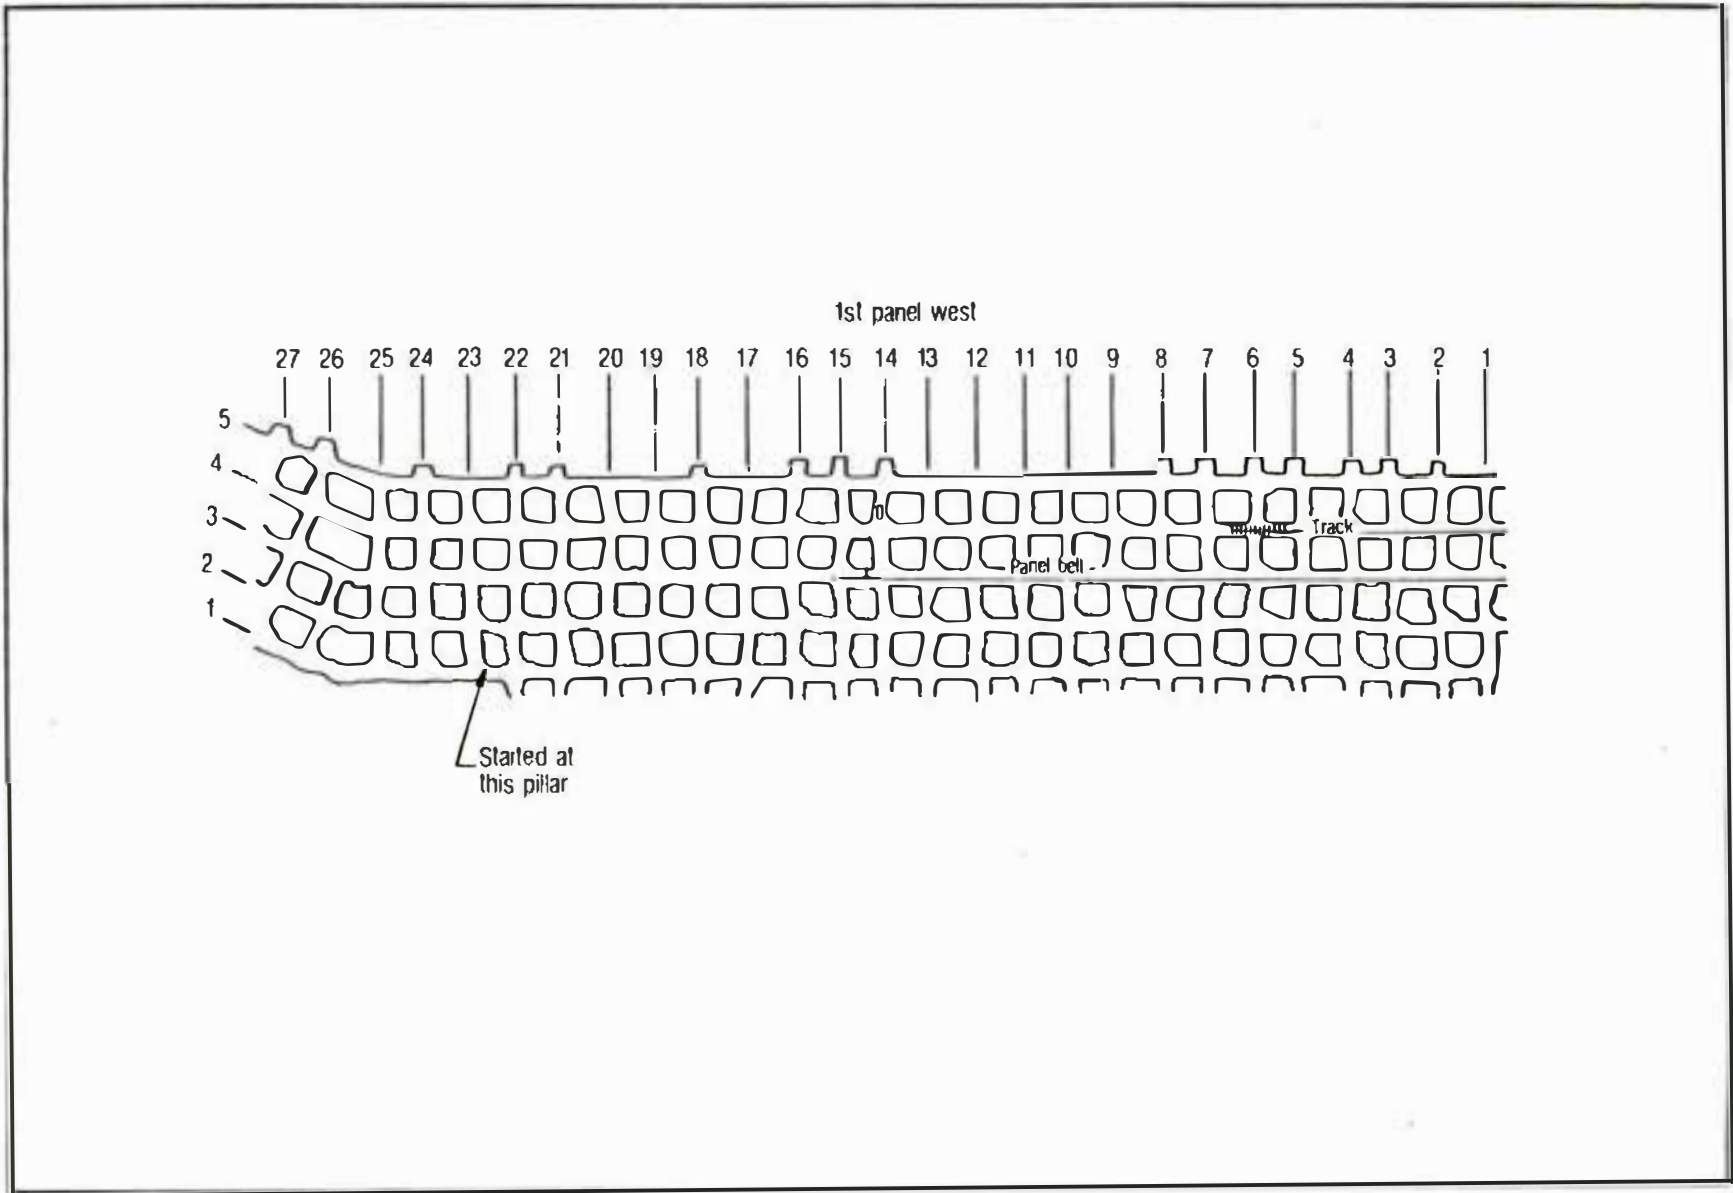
MINE SECTION WHERE DEMONSTRATION TOOK PLACE
